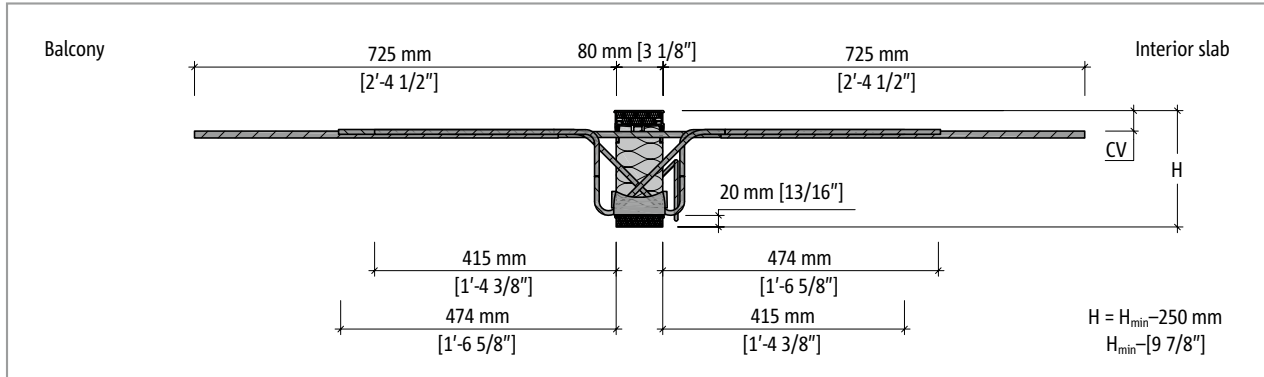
Schöck Isokorb® T Type CK-M6-VV1 to M11-VV1: Product cross-section
